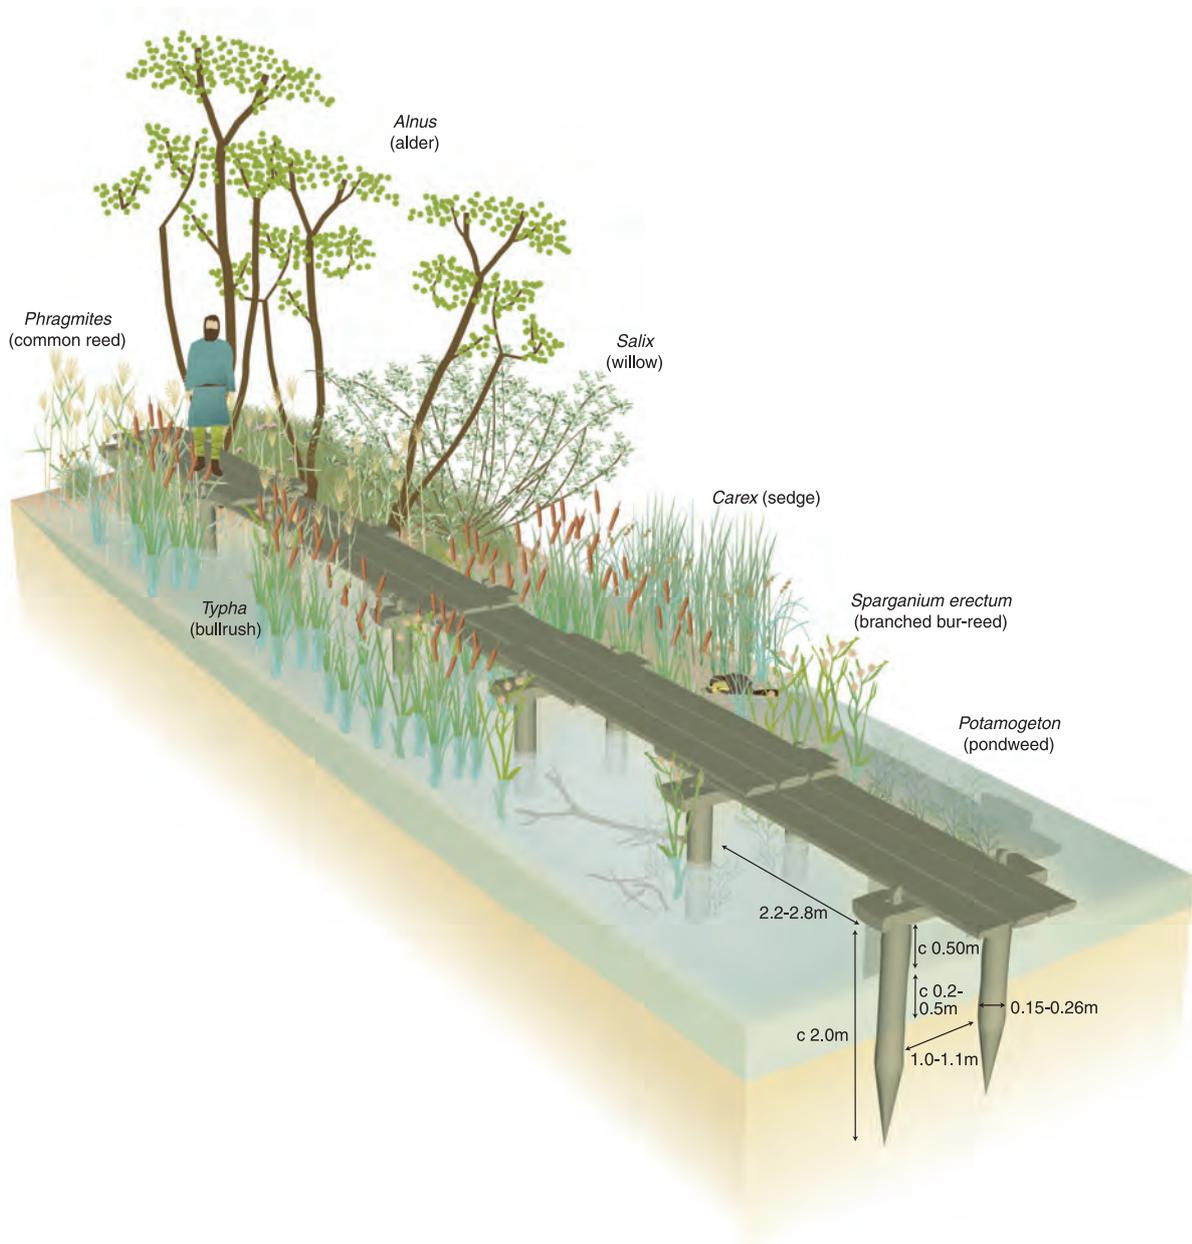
Reconstruction of the Freemasons Road 'bridge'
